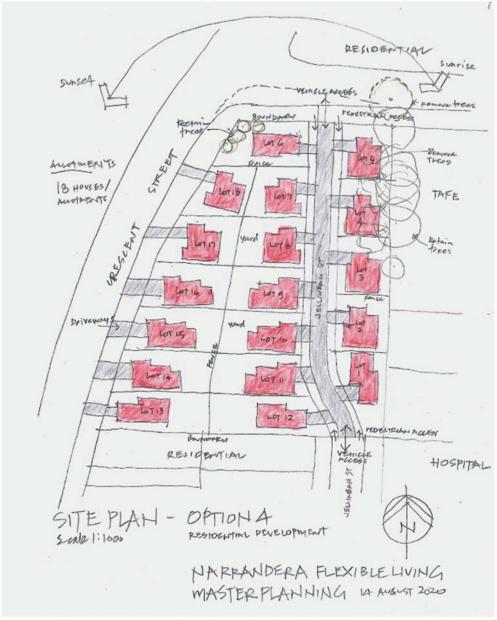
MASTERPLAN DESIGN CONCEPT - OPTION 4
